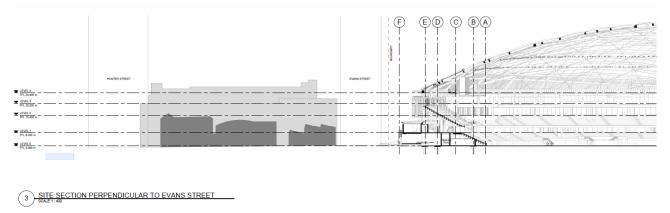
Site section along Evans Street (source: Appendix A - Architectural Documents, COX Architects).
